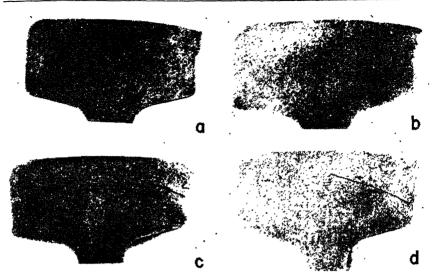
Four Internal Shelling Cracks Produced in Laboratory Rolling-Load Machines.
